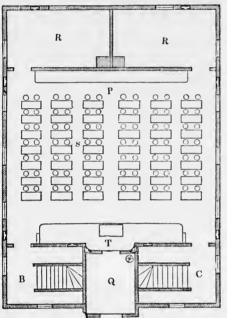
PLAN OF SECOND FLOOR, ADAPTED TO FIG. 124.
